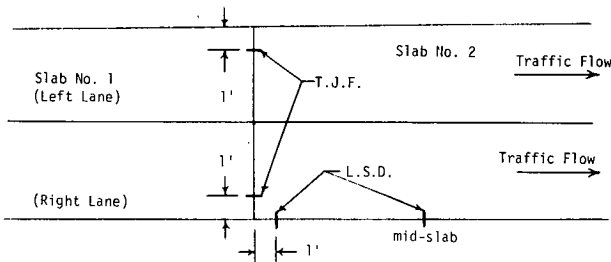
Suggested locations for transverse joint faulting and lane-shoulder dropoff measurements.
